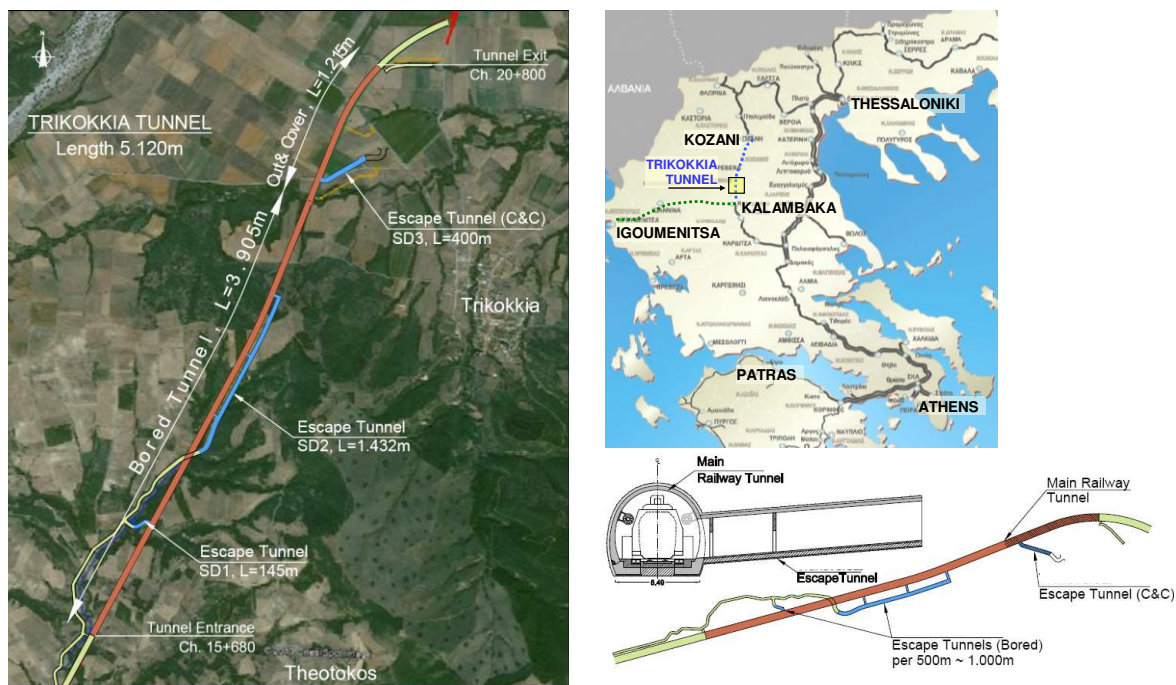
Location, layout and typical section of the Trikokkia railway tunnel. The inset presents an outline of the Greek Railway Network and the proposed new lines of the future Western axis (dashed lines), linking the port of Igoumenitsa to the cities of Kalambaka and Kozani.
